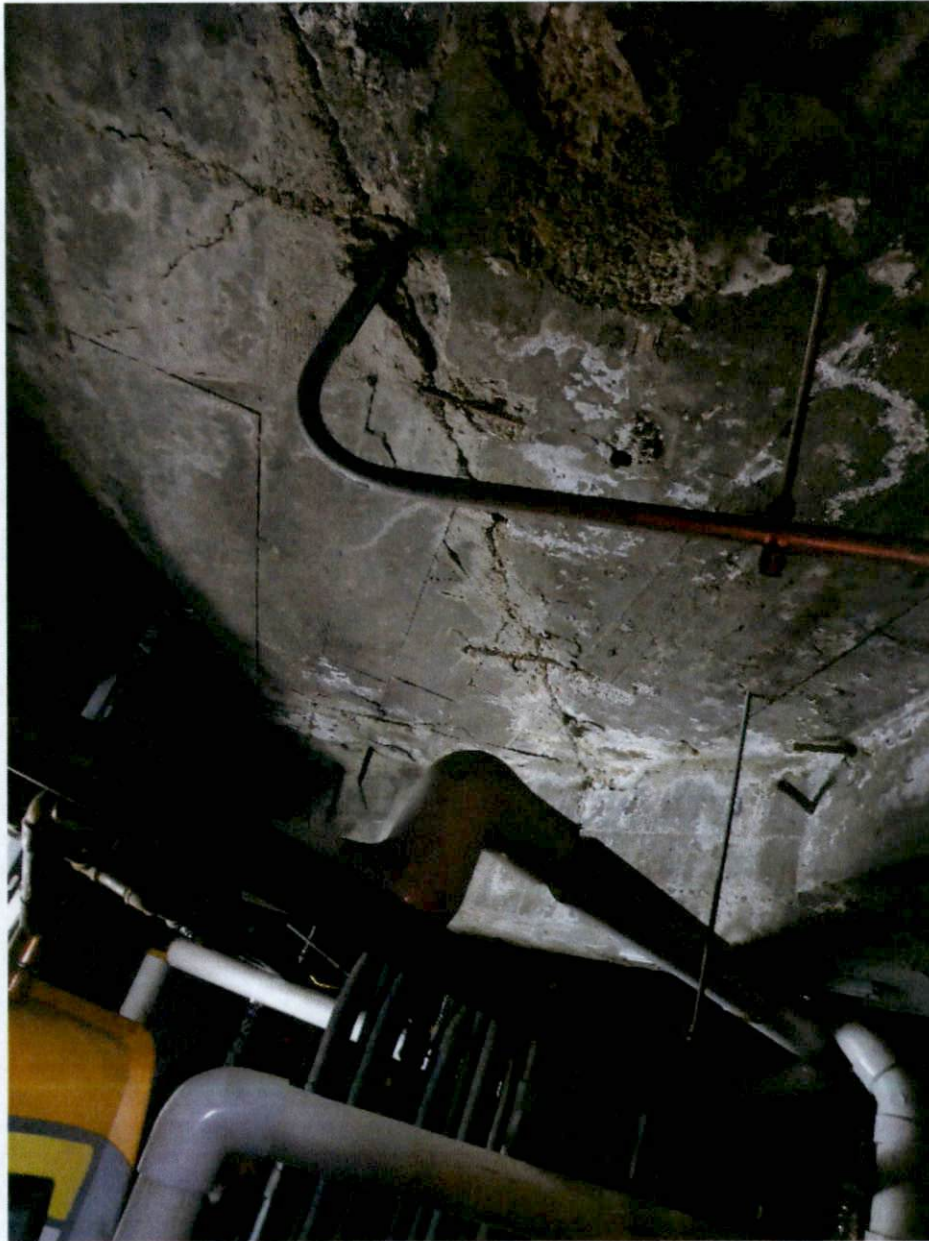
Large crack and visible rebar at underside of concrete roof deck – Tenth Floor.
